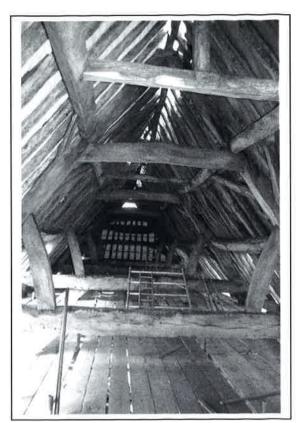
Roof from north Plate 16: Double mortice to west face of south arcade post to Frame V. Suggesting former porch.
